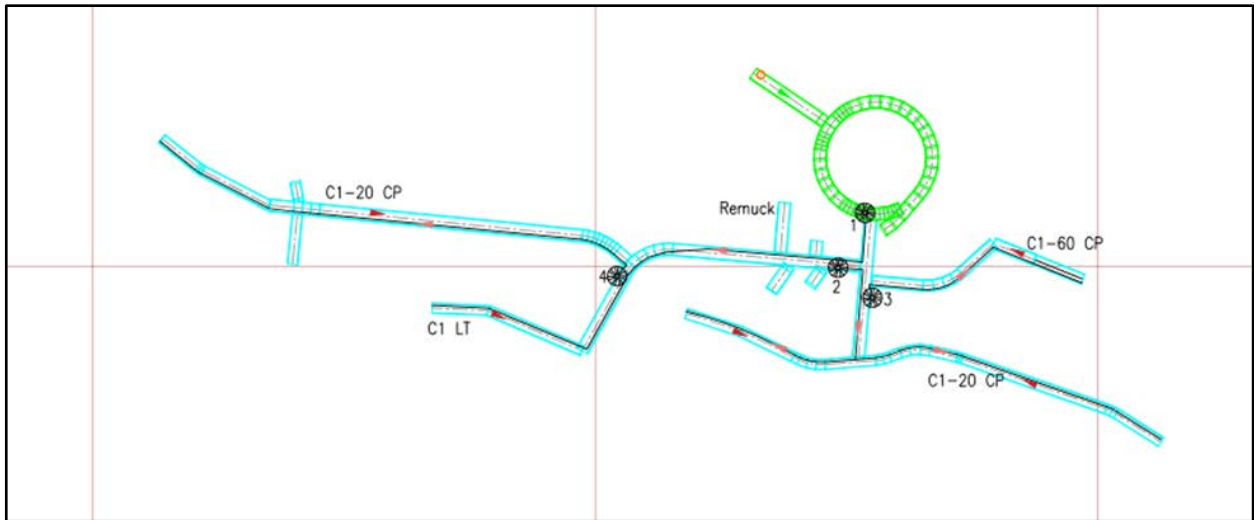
Level plan of Zone 1 typical ventilation (forced ventilation)
